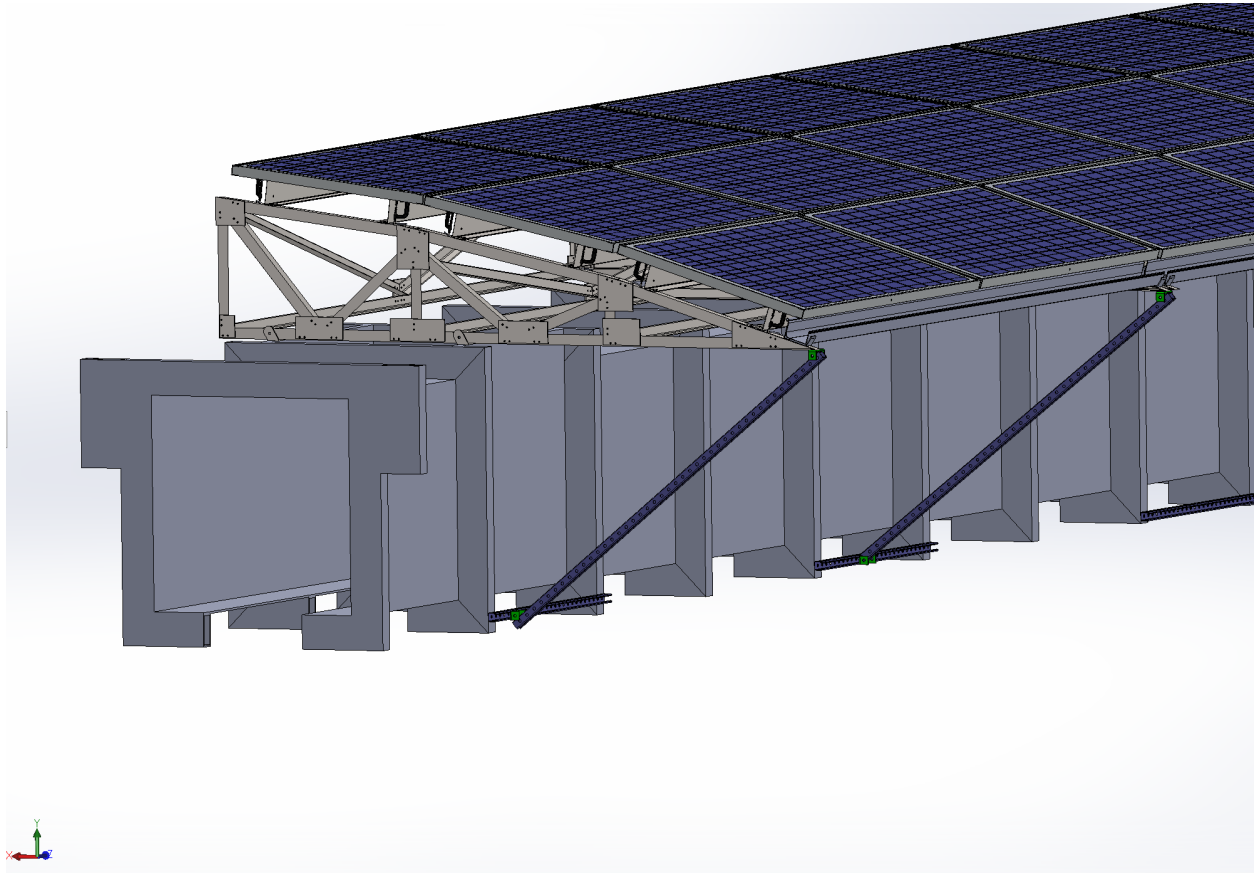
Brackets to Secure onto Guideway. An adaptation of U-brackets used in other elevated designs customized to secure the bottom chord of the racking to bridges on the guideway. The brackets will likely be welded to the bridges; the racking will be placed into the brackets and subsequently bolted in place.
